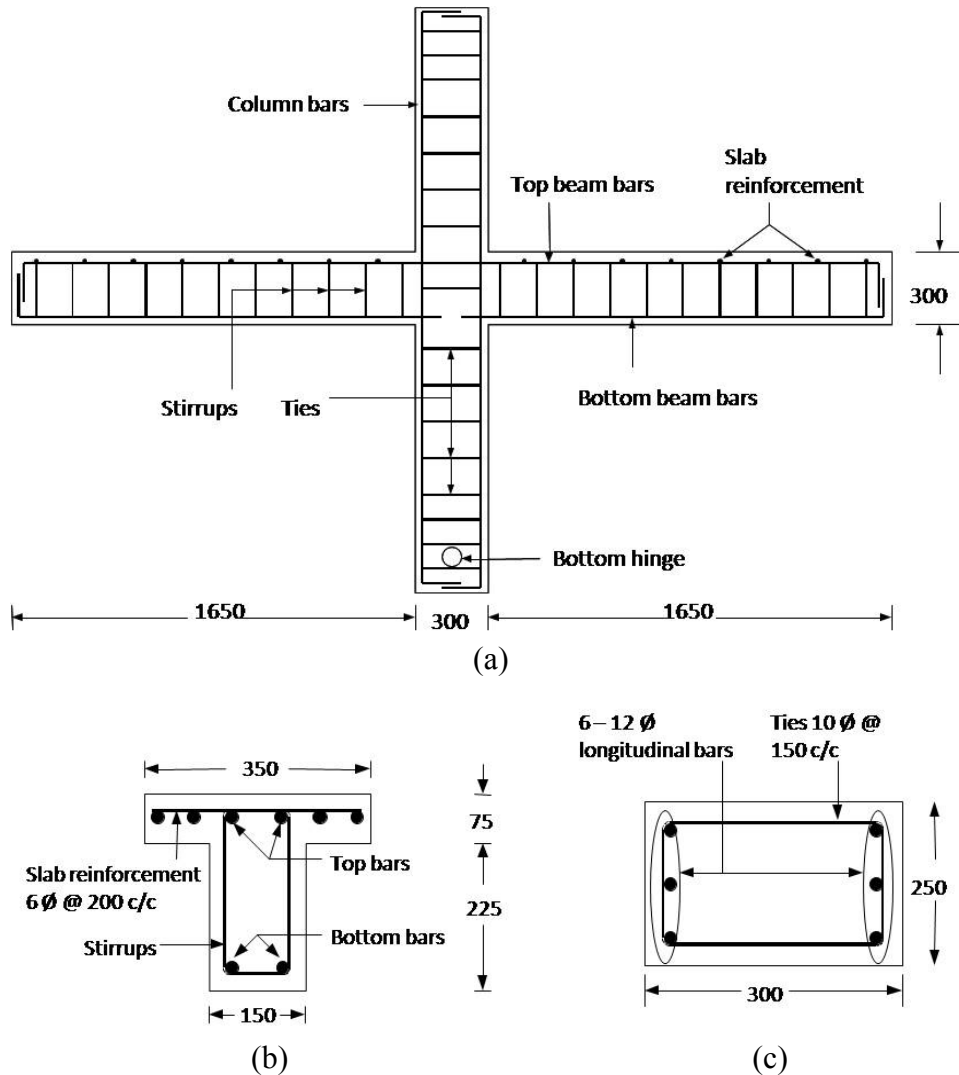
Sectional details for reference sub-assembly specimens (all dimensions are in mm): (a) sectional elevation; (b) beam section; (c) column section
